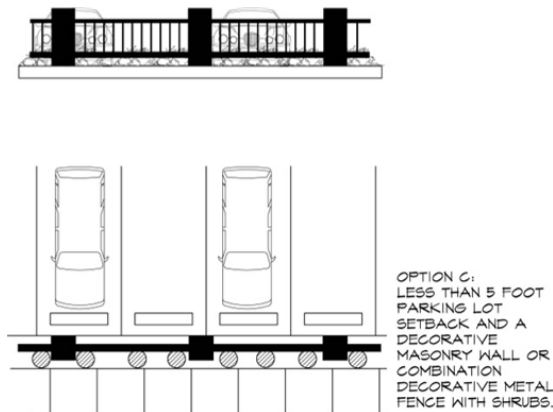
Typical Reduced Landscape Strip – Requiring Fence
